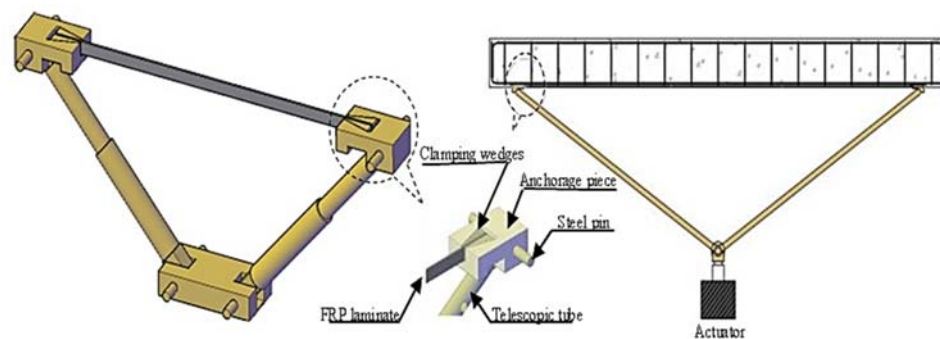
Prestressing system for real applications developed by Barros (2009)
